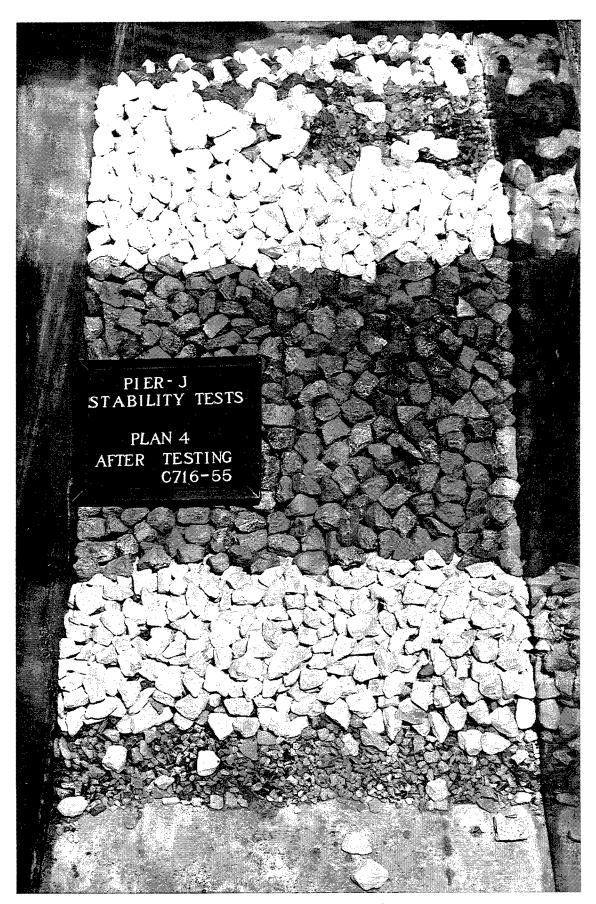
Sea-side view of Plan 4 at the conclusion of testing
